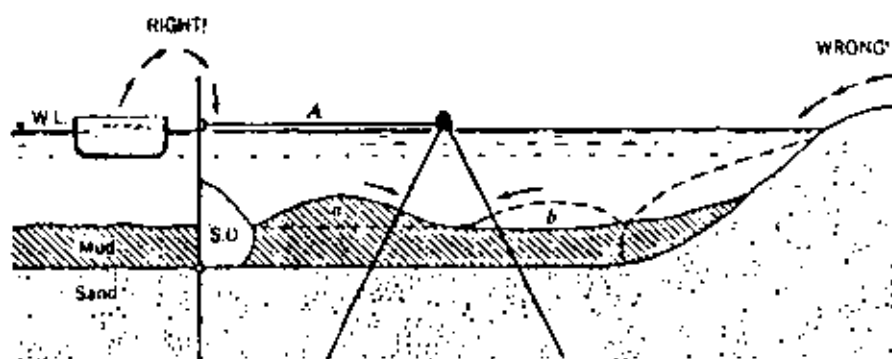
Right and wrong way to place sand backfill. The "right" way will offset only some unfavorable consequences of not dredging out all the mud layer first.
